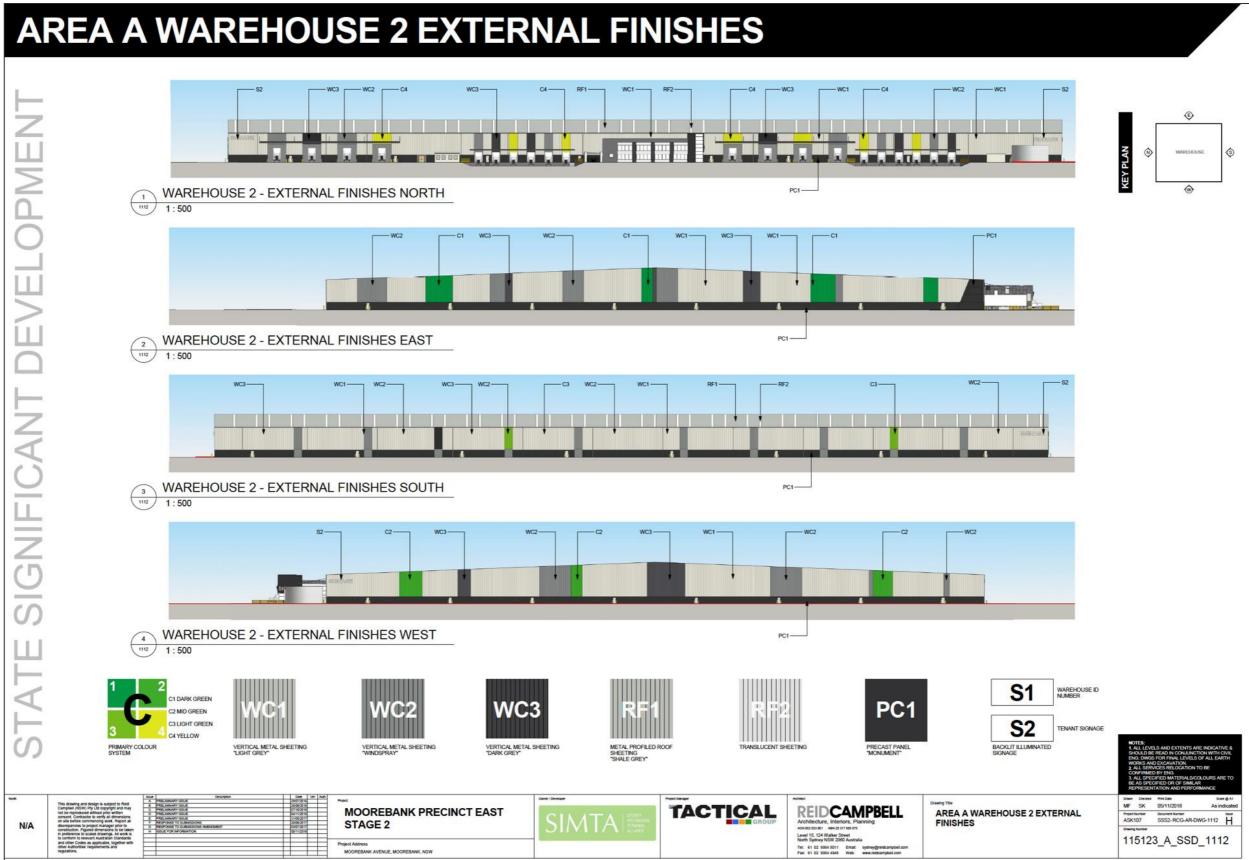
| Examples of warehouse identification signage (Source: Applicant's MOD 1 Modification Report)
